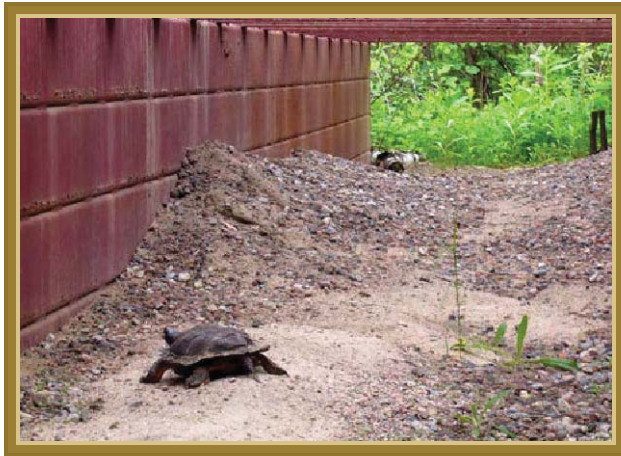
A turtle crossing a dirt path next to a corrugated metal wall. The turtle is facing away from the camera, moving towards the right. The ground is uneven and appears to be a construction or maintenance site.
